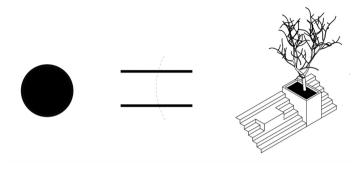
Architectural element – staircase with flower pots and greenery at the Vienna Central Mosque Source: Authors' own collections.
